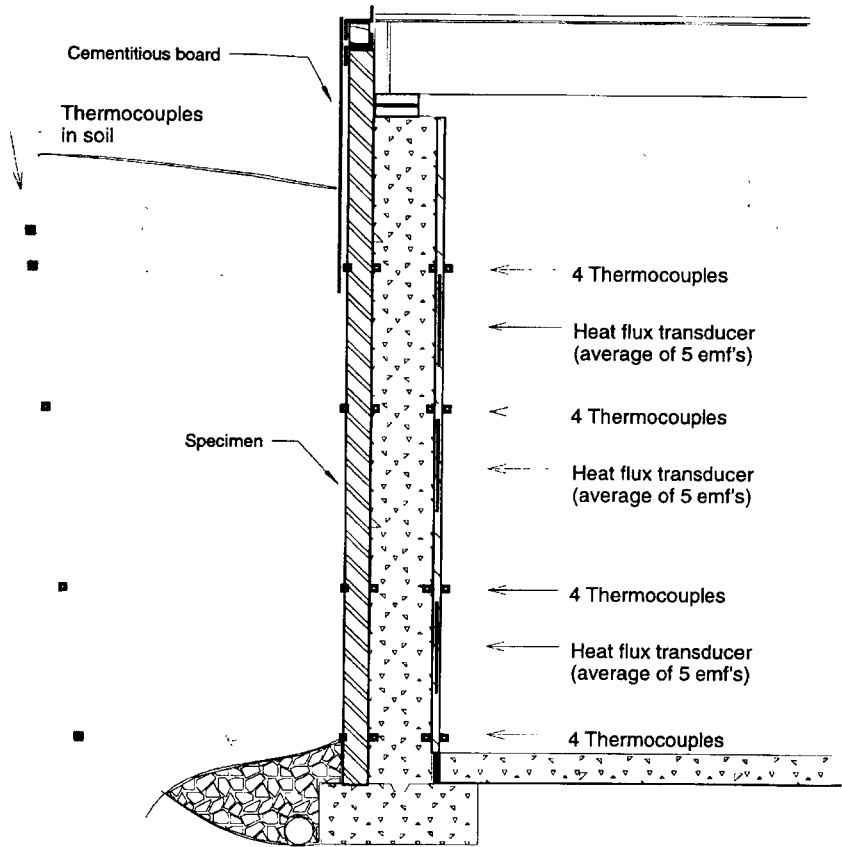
Thermocouples and calibrated insulation specimens mounted on the west wall.
